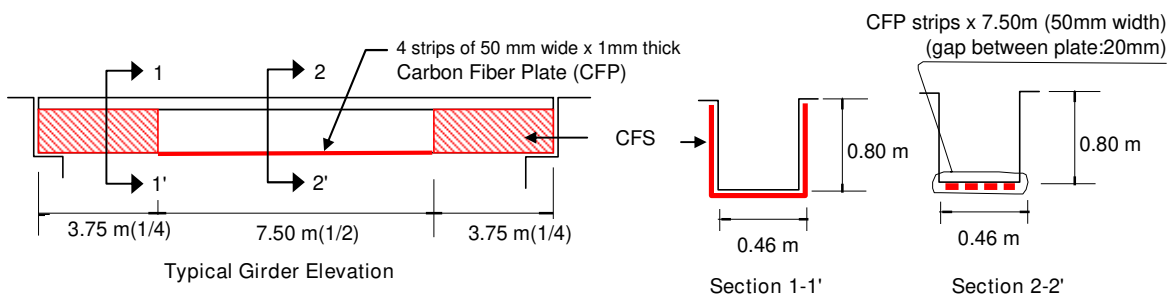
Arrangement of Carbon Fiber Sheet/Plate (For Reference)
